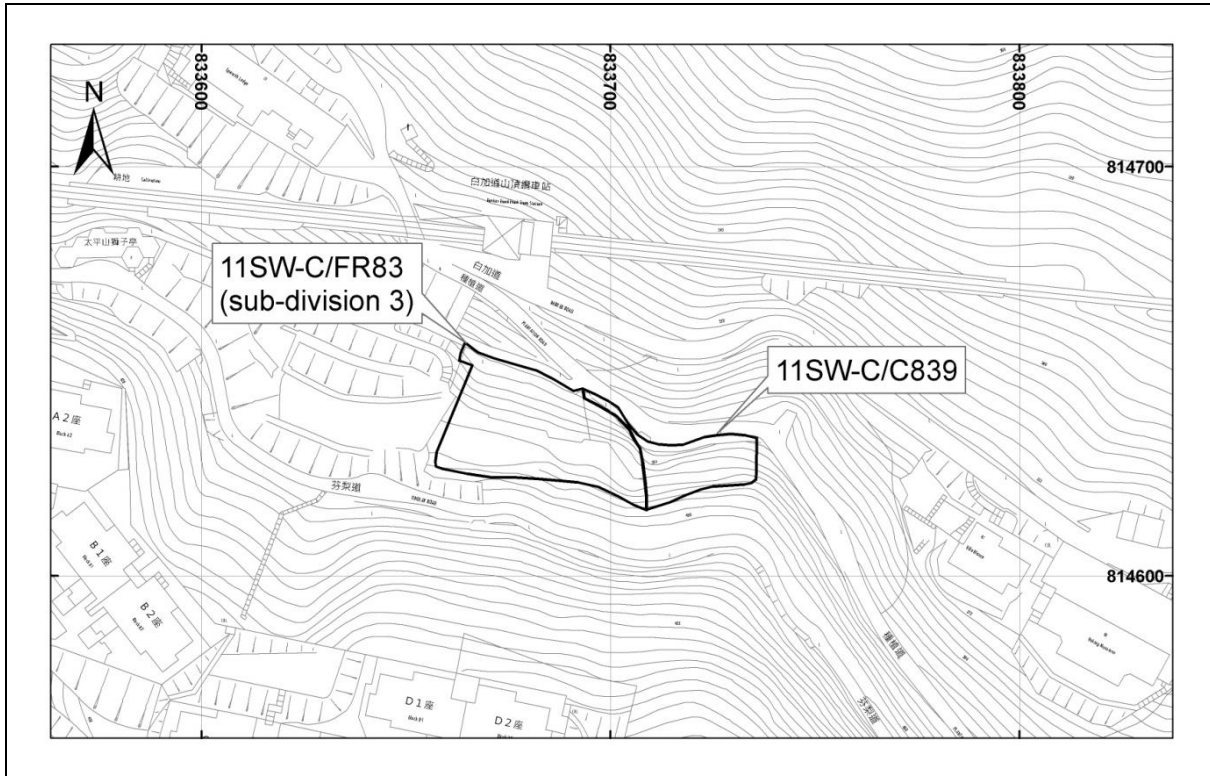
Location Plan of Slope No. 11SW-C/FR83 (sub-division 3) and Slope No. 11SW-C/C839 at Plantation Road
